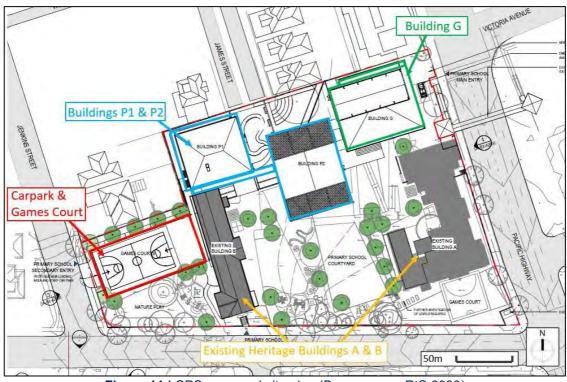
| CPS proposed site plan (Base source: RtS 2020)
